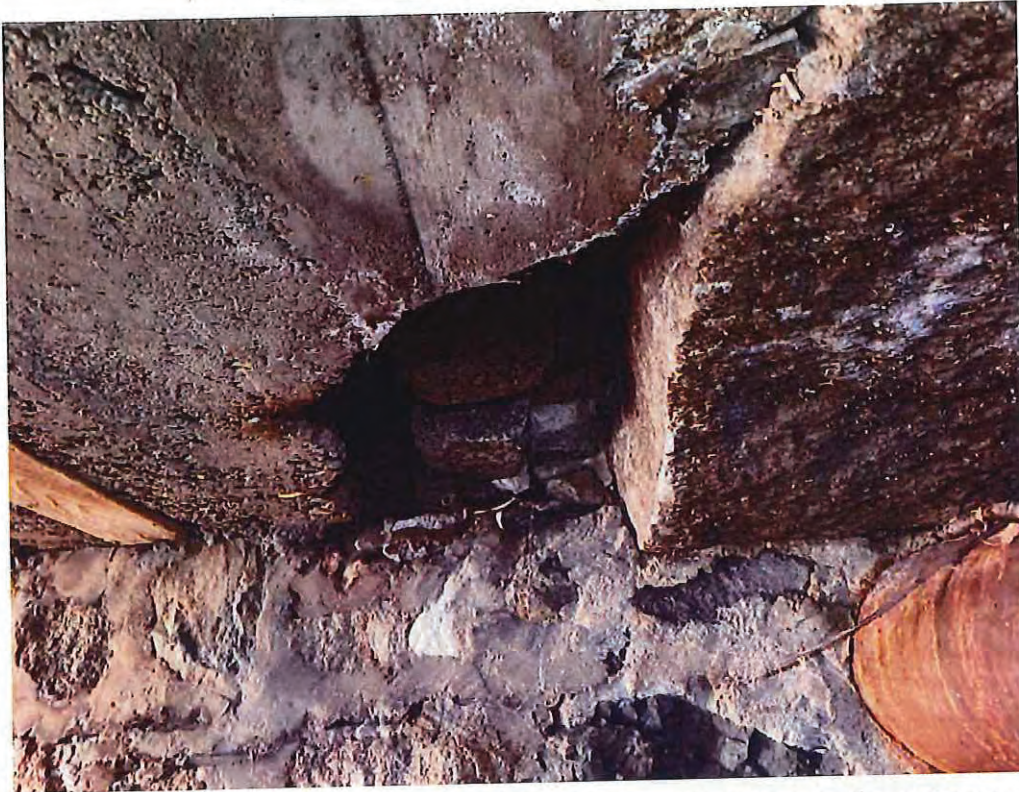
Second concrete slab from the east: spall at the southwest corner exposing granite blocks and asphalt above.
